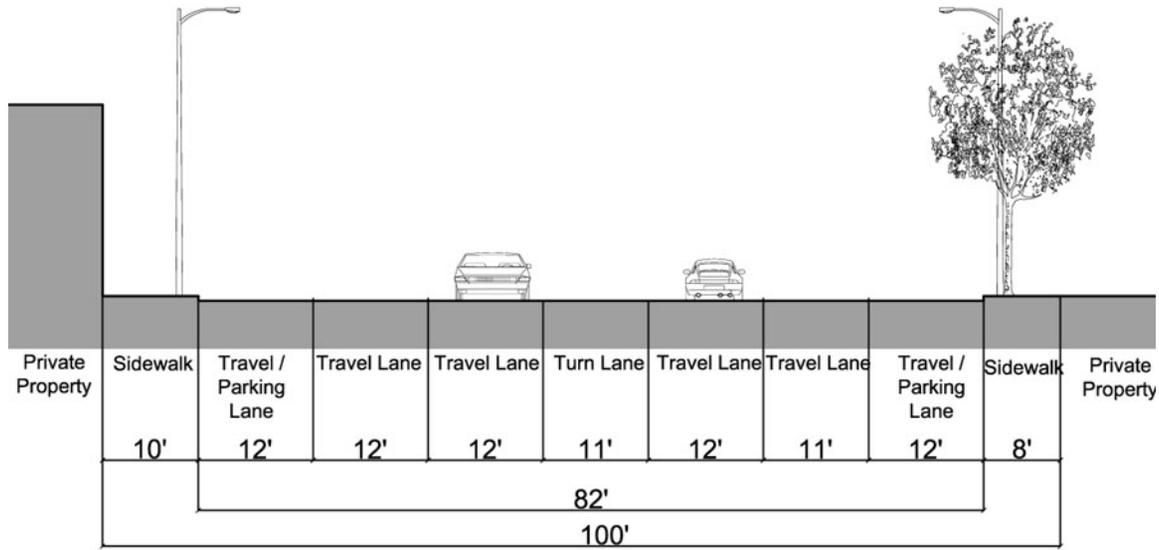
Existing cross-section on Atlantic Boulevard.
